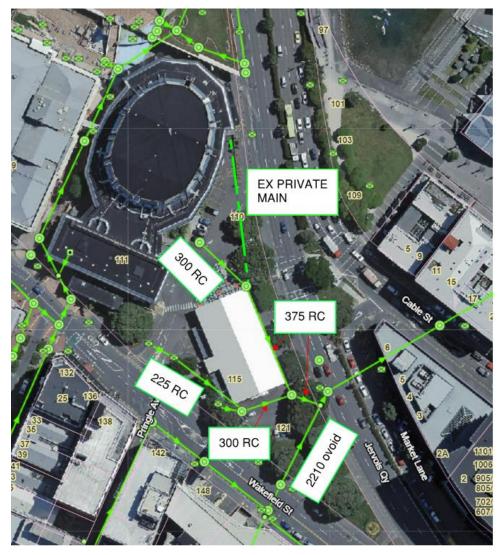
Existing public stormwater infrastructure (Source: Wellington Water's Regional Water Stormwater Wastewater App)
